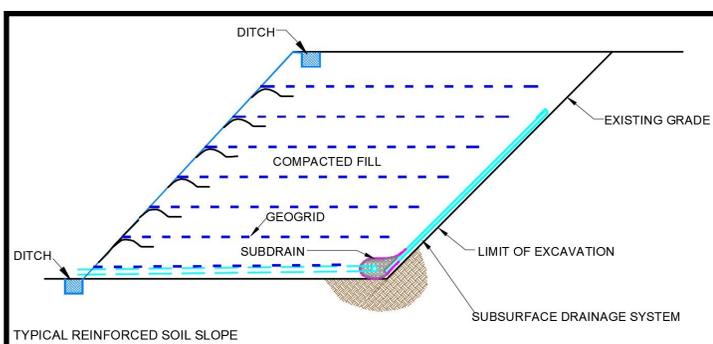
DRAWING OF A TYPICAL REINFORCED SOIL SLOPE (RSS)
